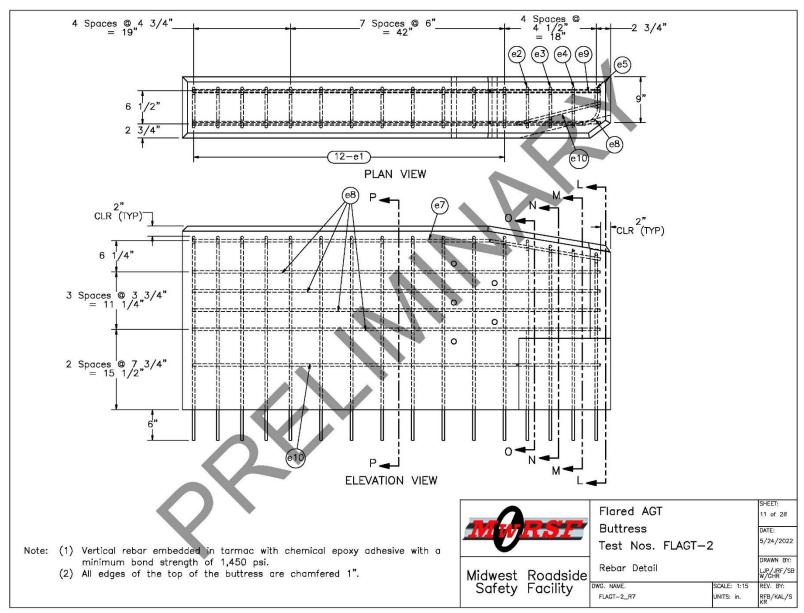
Buttress Rebar Detail, Test No. FLAGT-2
